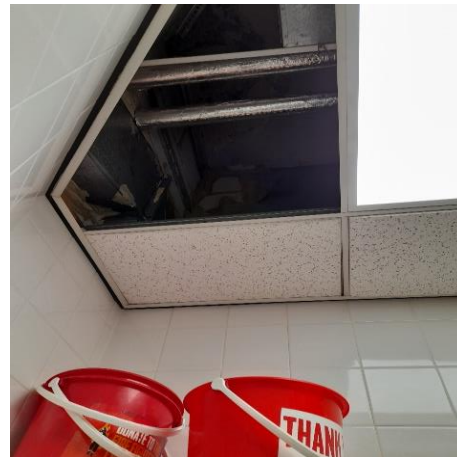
Piped Services Penetrations Through Wall in Cleaner Cupboard
